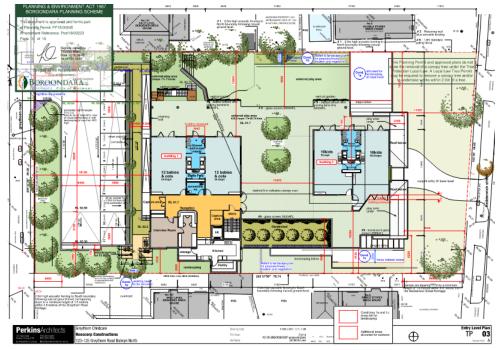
Endorsed Entry Level Floor Plan (Post18/00223 - 15/8/2015)
